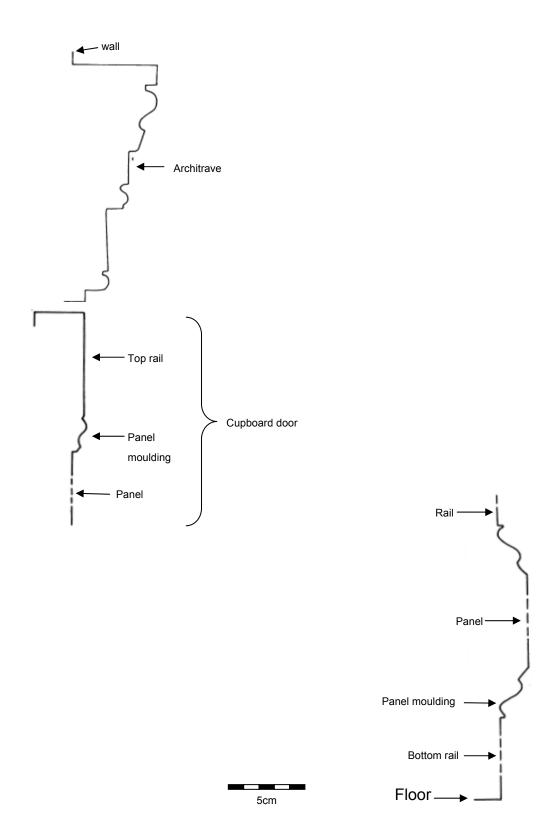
Room 4, cupboard door and architrave in east wall (left).
